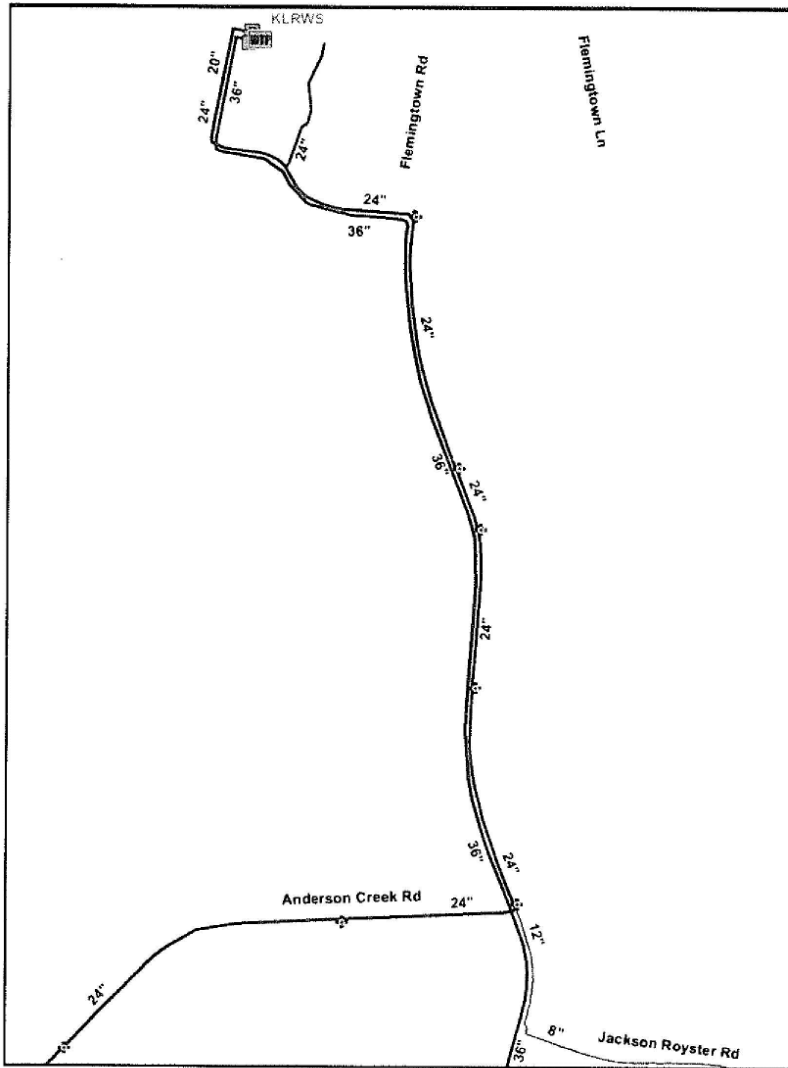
Trunk Mains from Kerr Lake Water Treatment Plant
